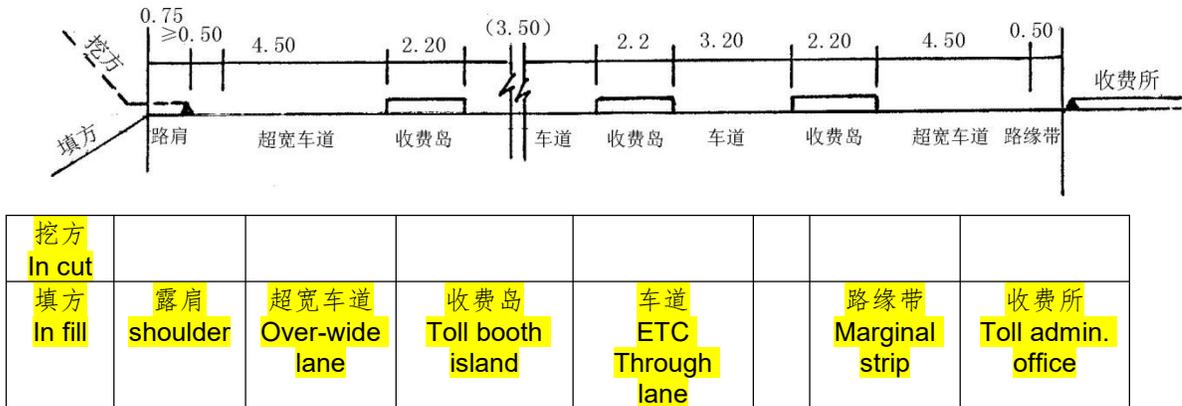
Roadway Cross-section at Centerline of toll plaza
